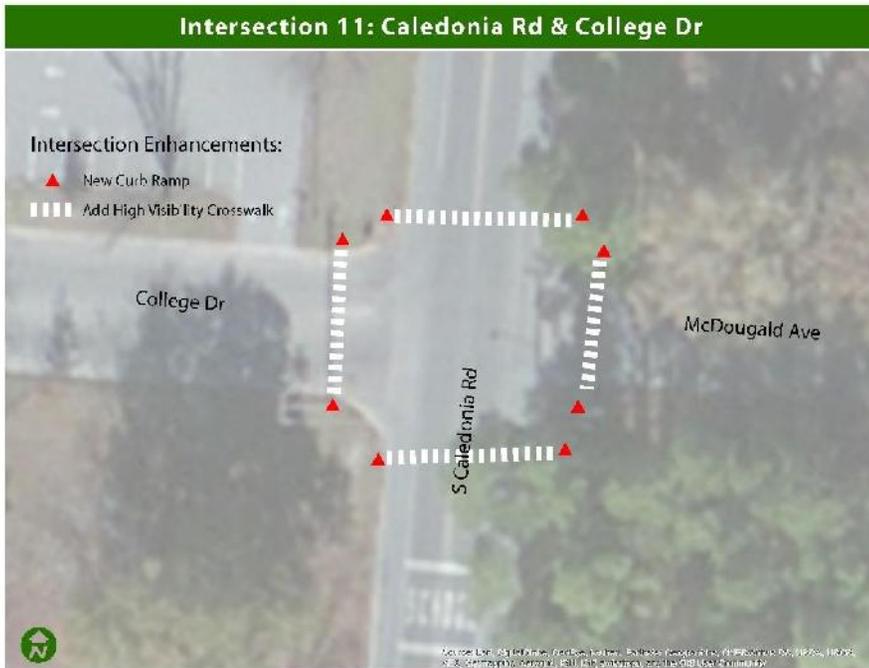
The Caledonia Road and College Drive intersection is adjacent to Washington Park Elementary. As mentioned previously, Caledonia Road should be outfitted with traffic calming facilities. Please note, as part of the pedestrian network recommendations, a separate off-street multi-use path (greenway) is proposed for the west side of Caledonia Road.
